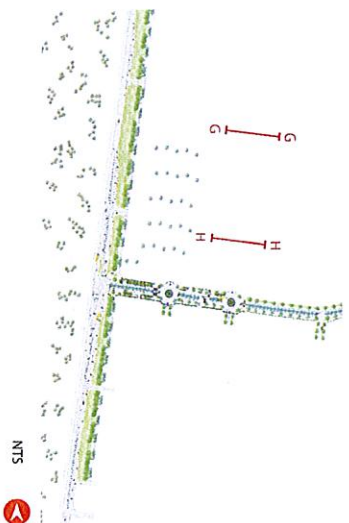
Indicative Cheviot Terrace Landscape Concept Plan
